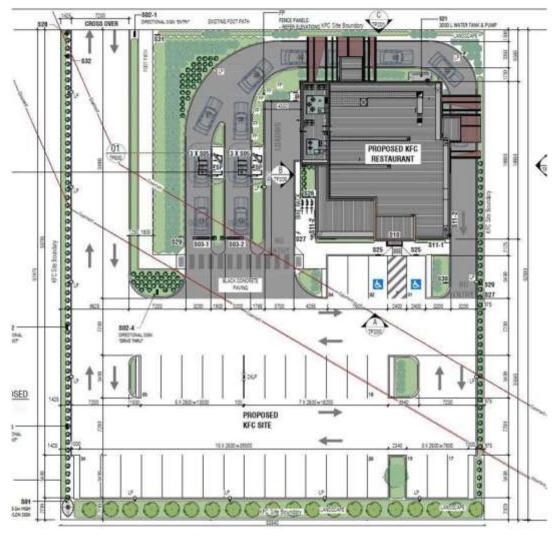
Detailed Site Plan (Source: Voda Building Services)
